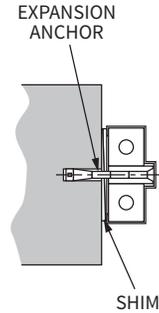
Existing Masonry or Poured Concrete Wall Anchorage
